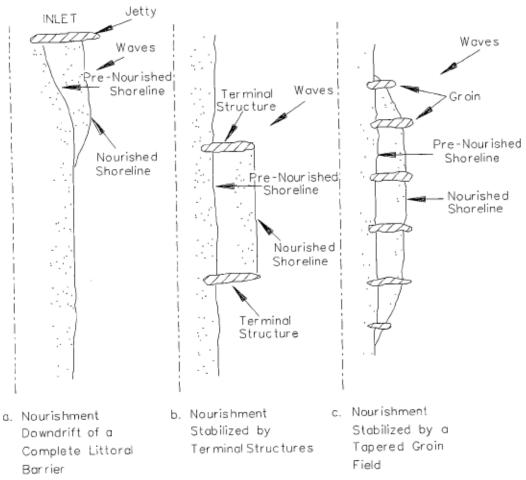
Use of structures to enhance beach nourishment projects. (CEM, Beach Fill Design, 2003)
